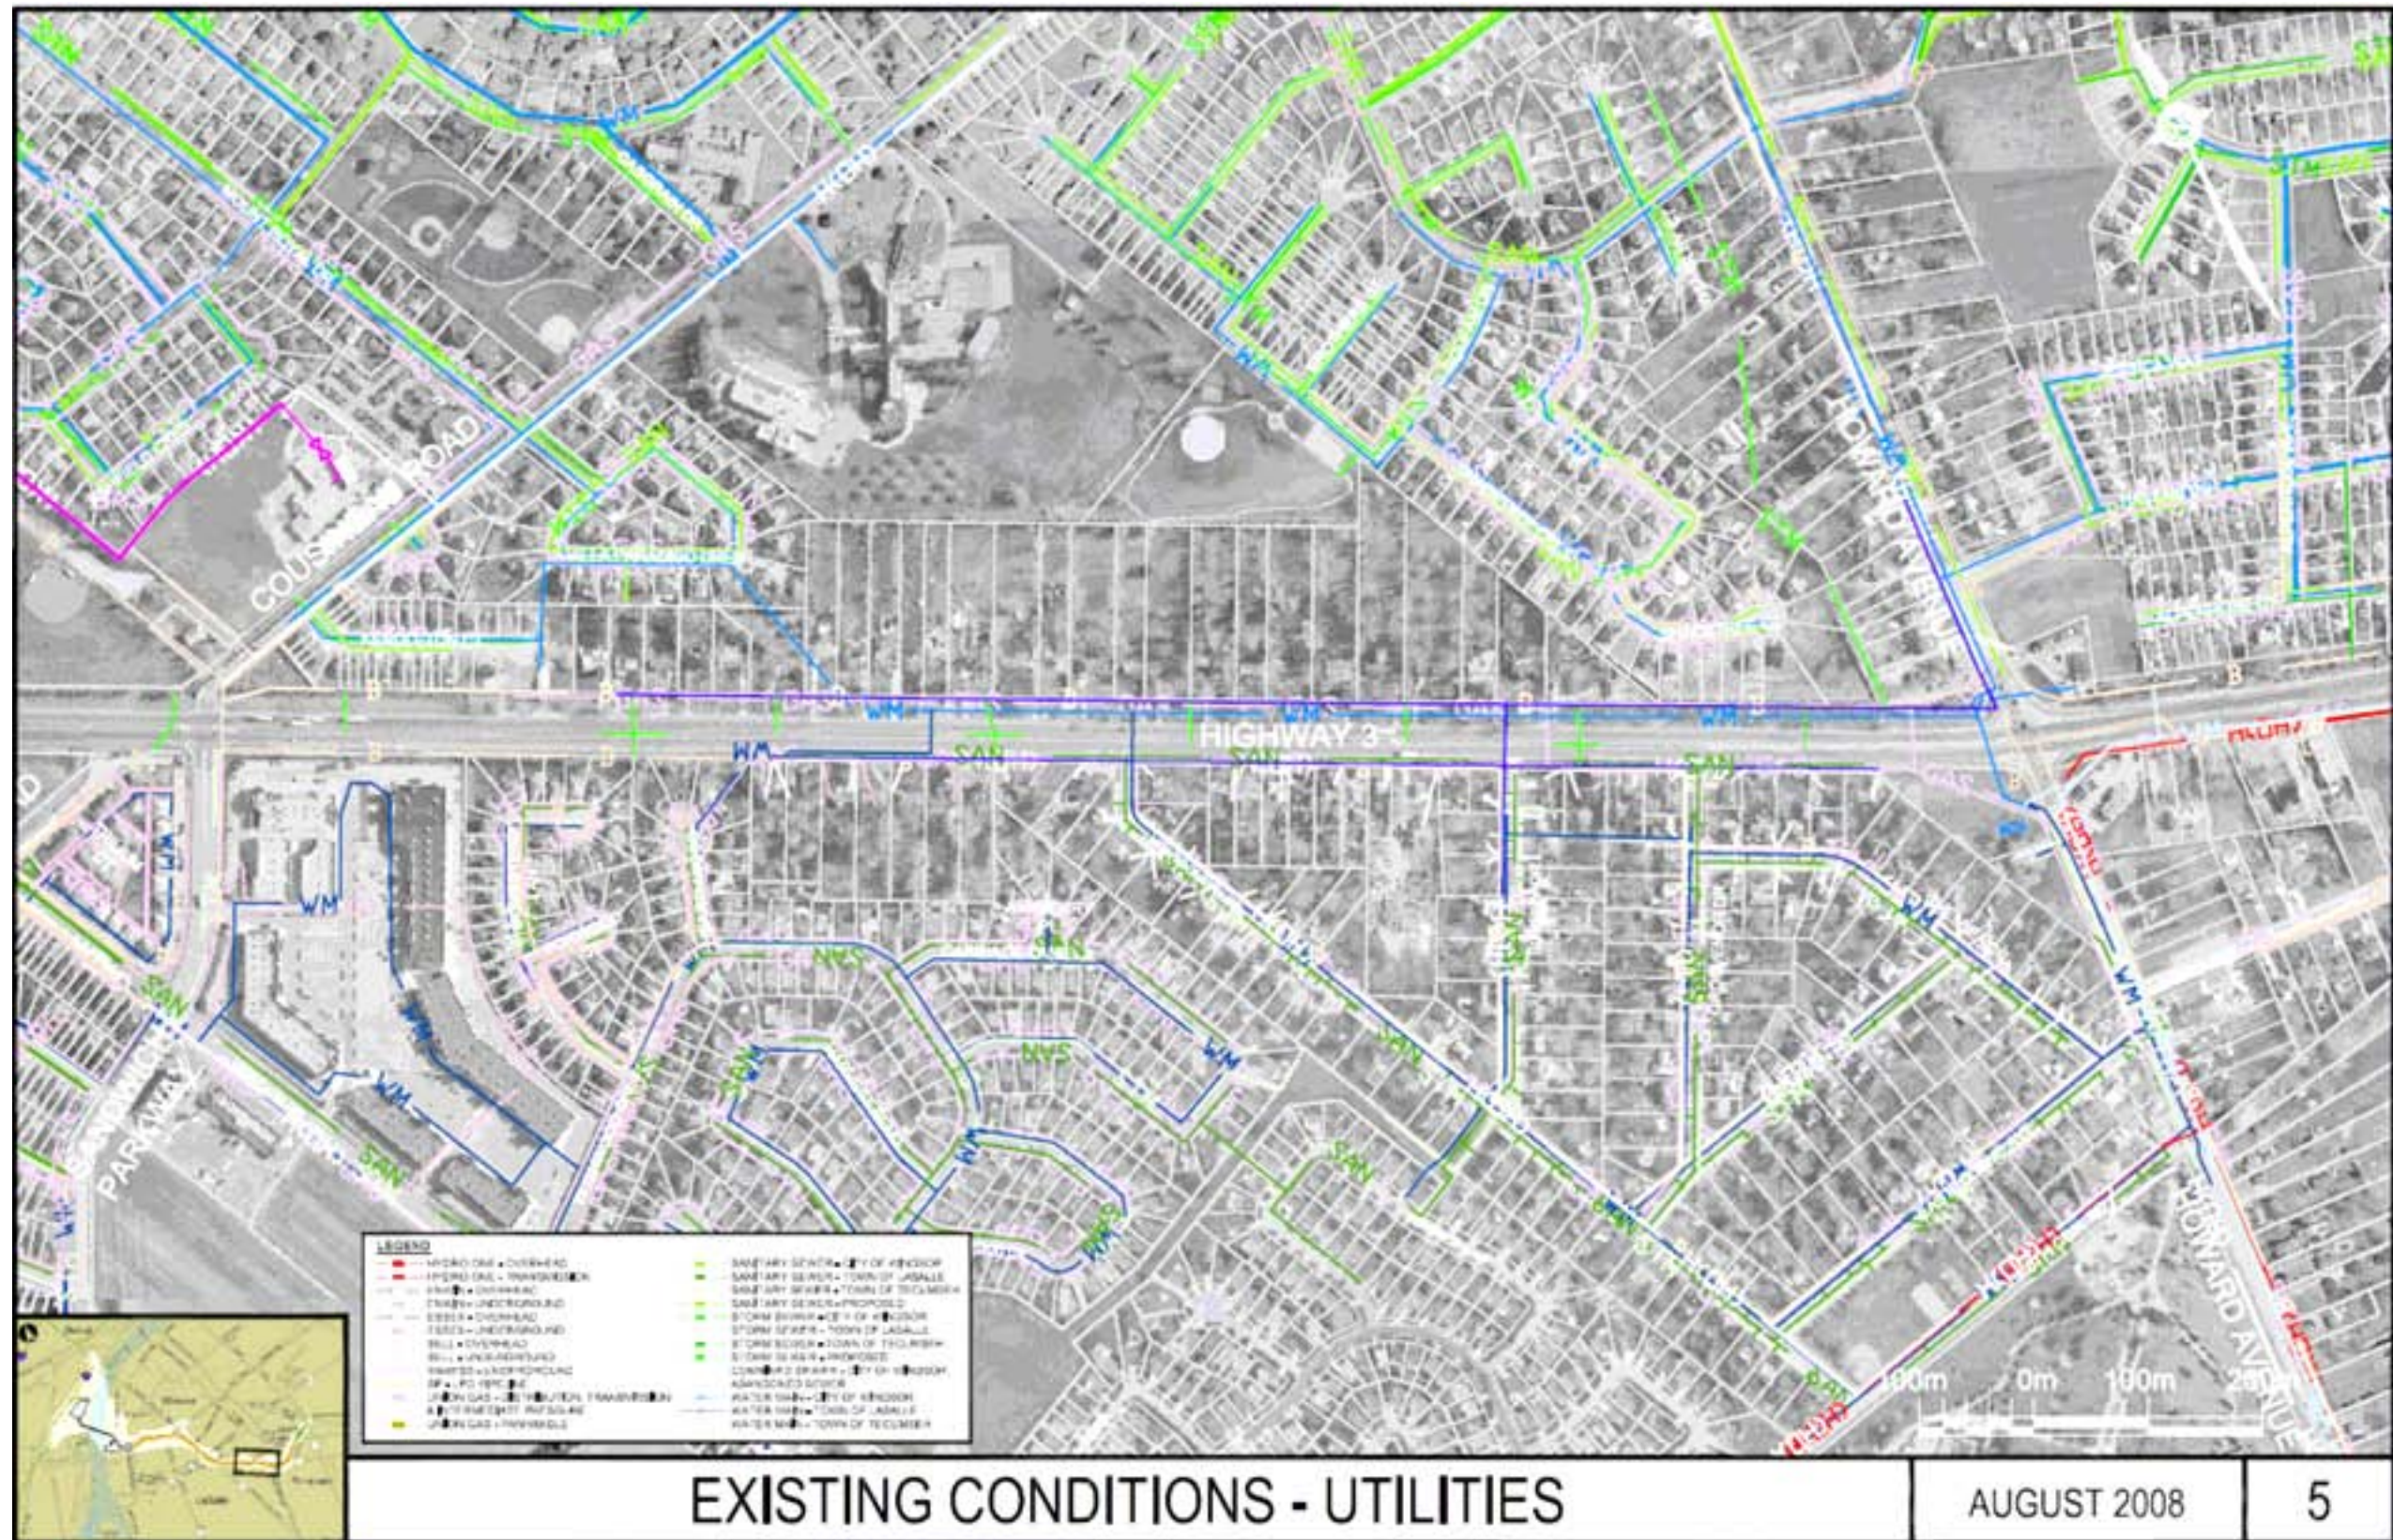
F – EXISTING UTILITY CONDITIONS (HOWARD AVENUE TO NORTH TALBOT ROAD)
